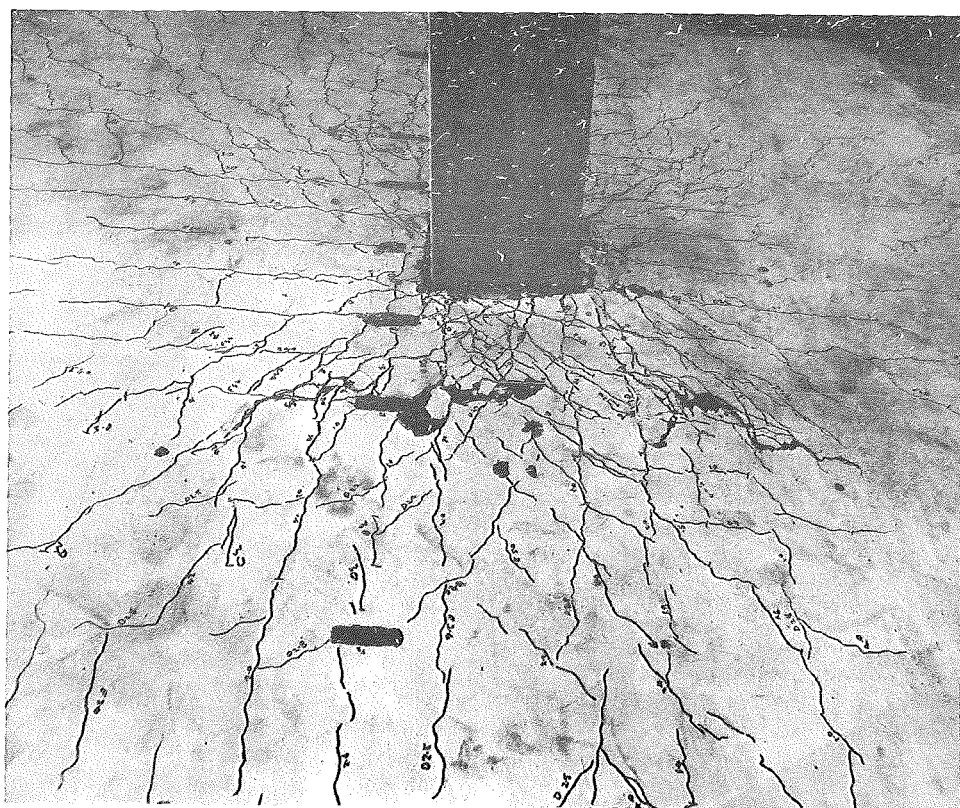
CRACK PATTERN OF SPECIMEN 8CS AFTER TEST
